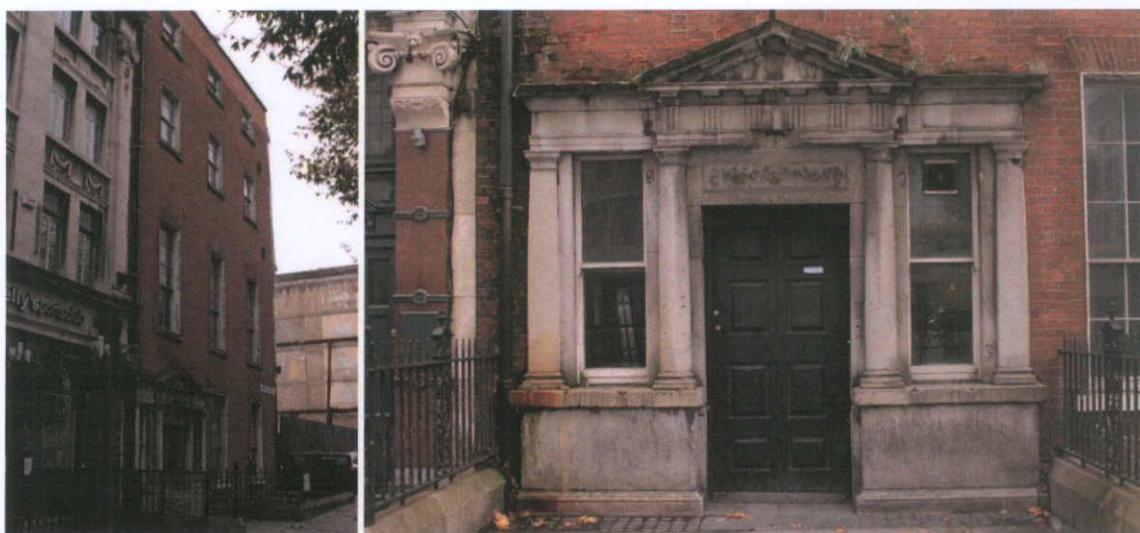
Four-storey-over-basement façade with parapet in later brick, with railings on a granite plinth enclosing the basement well; and a tripartite Neo-Classical doorway of imported English limestone.
